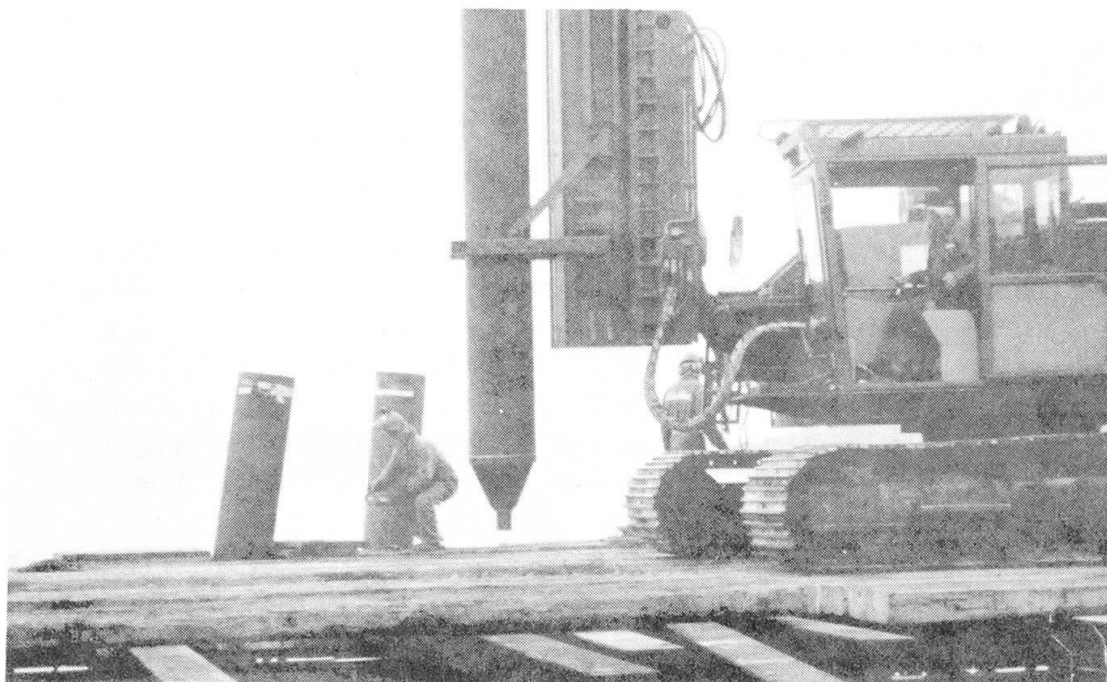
Pile driving equipment used for foundation at support N6 and N7.
